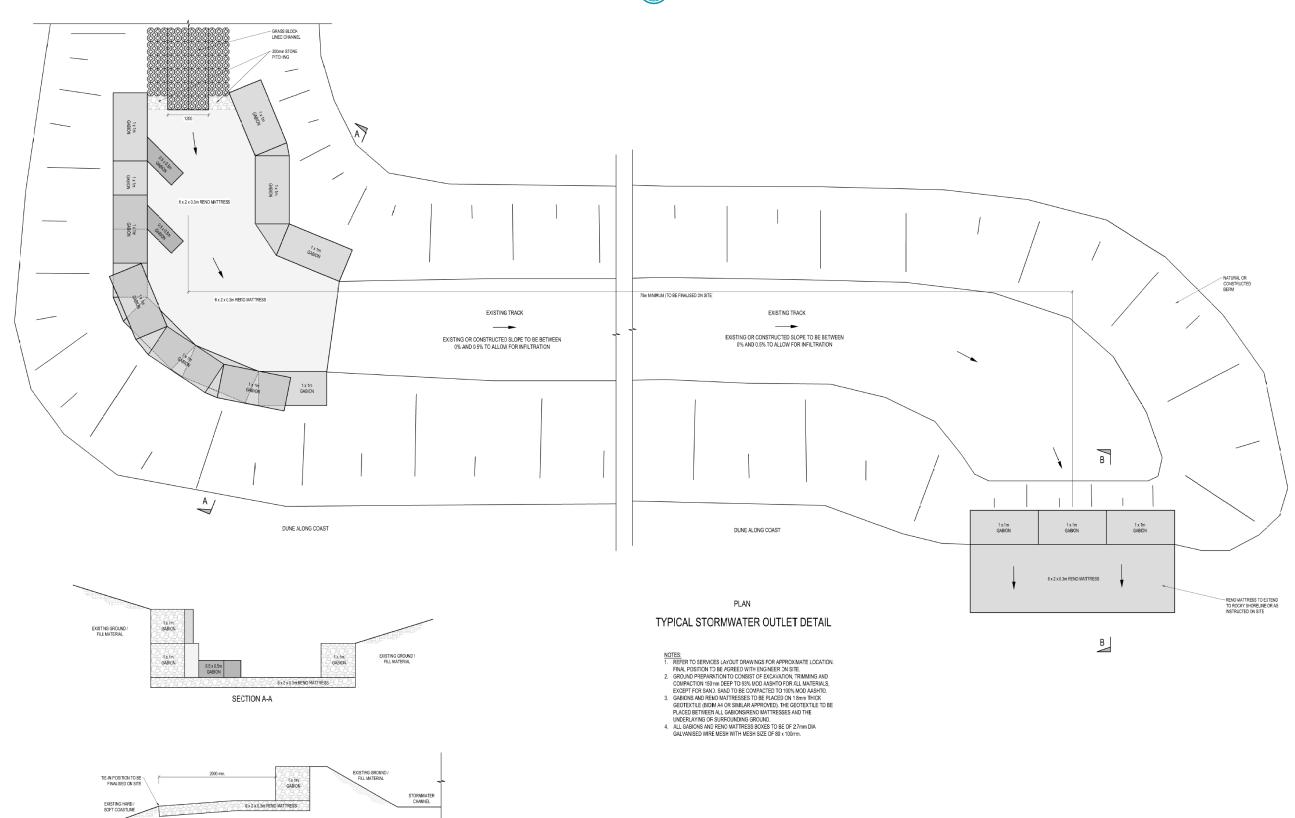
Typical details of stormwater structures provided by the CDC.
